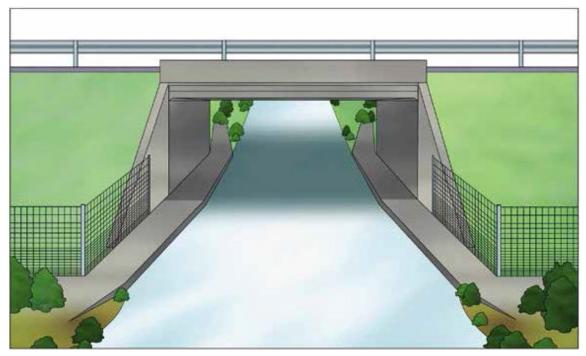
Diagram of a culvert adapted for terrestrial wildlife.
